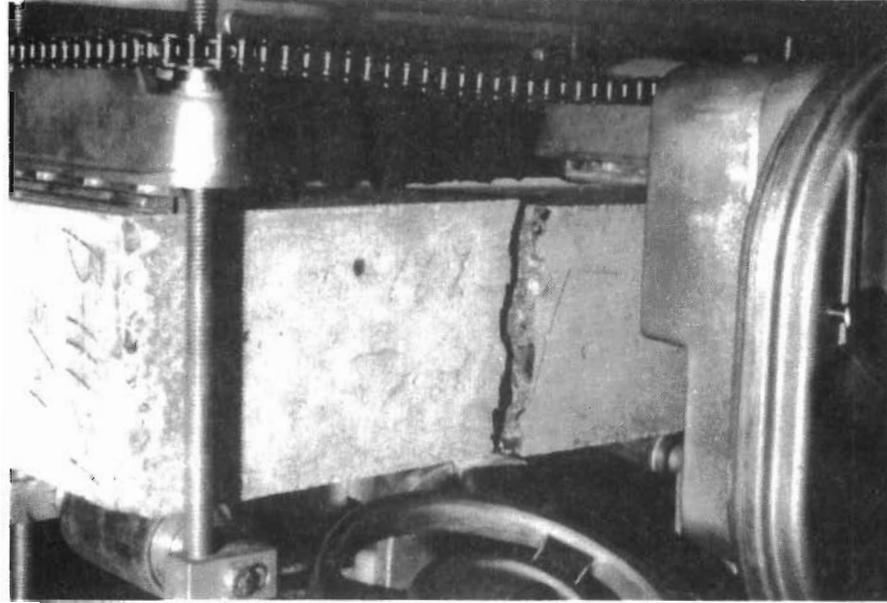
Close-up of typical fracture plane of beam specimen.
